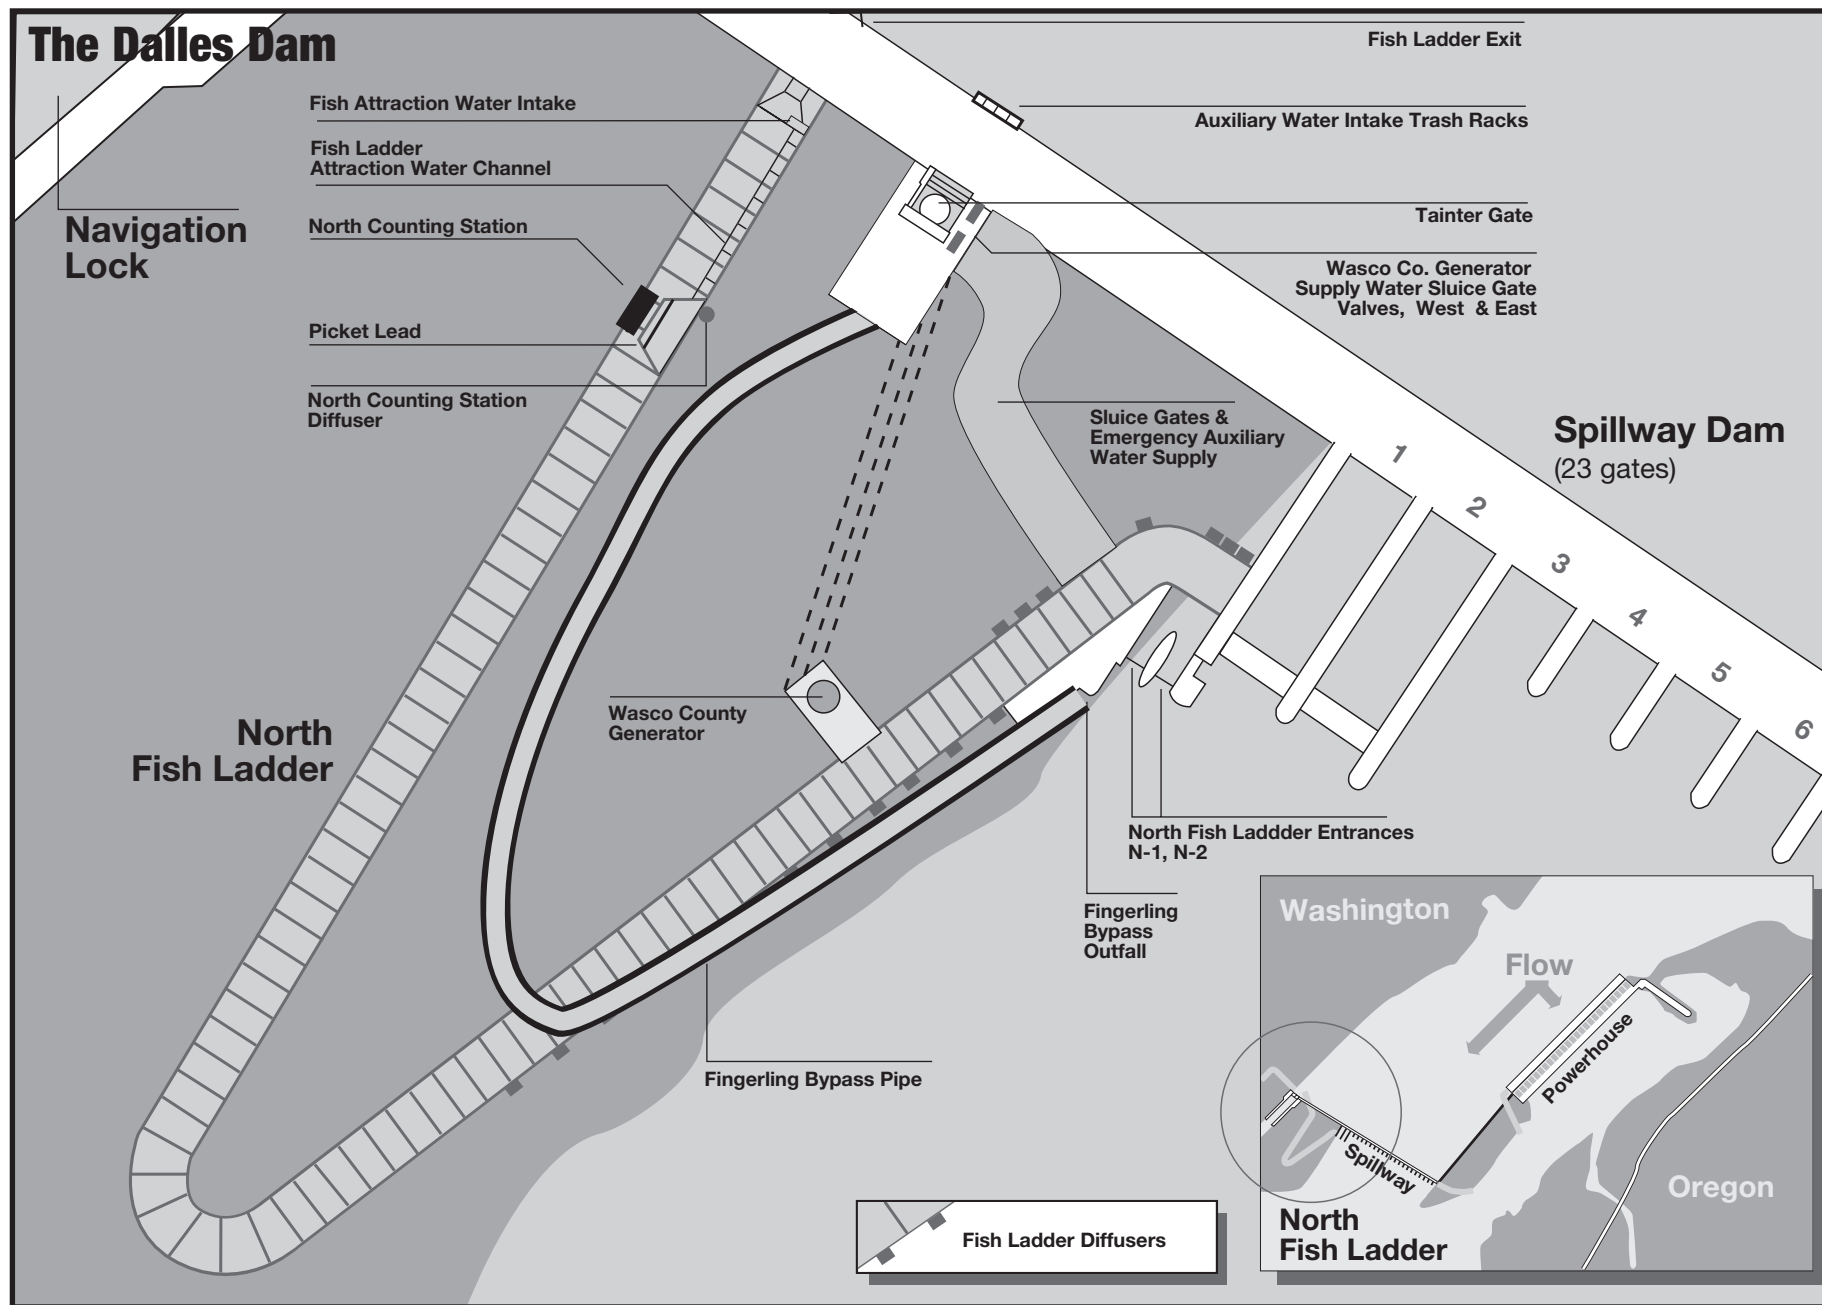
The Dalles Dam North Fish Ladder and Spillway.
